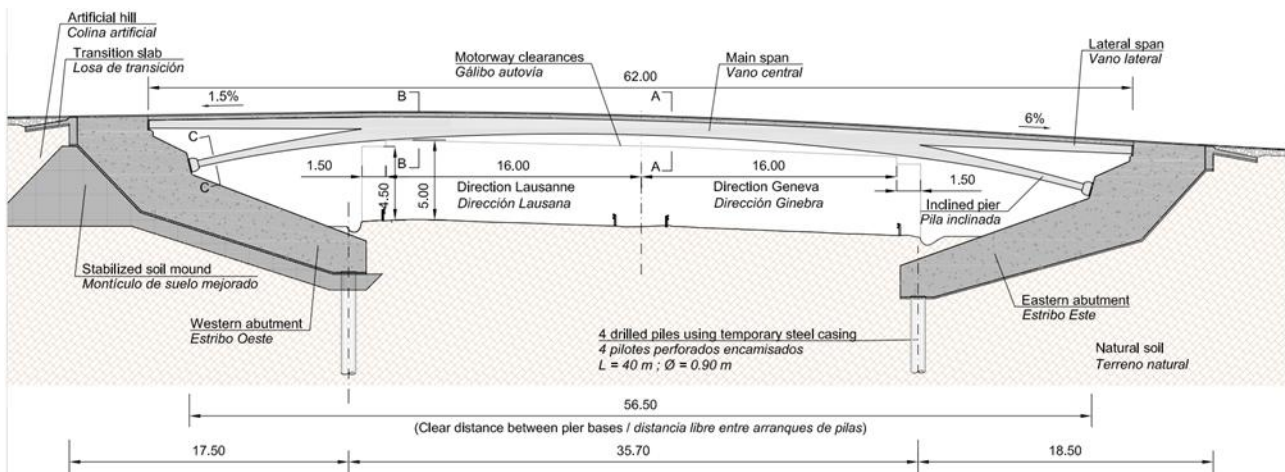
Elevation of the integral arched-shaped frame footbridge.
